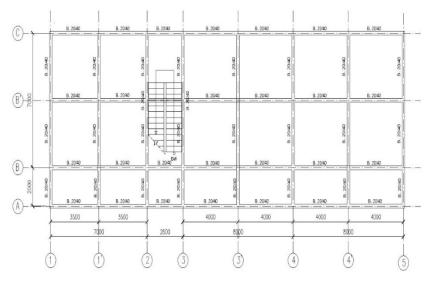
Building ringbalk floor plan TK A Source : Personal document image
